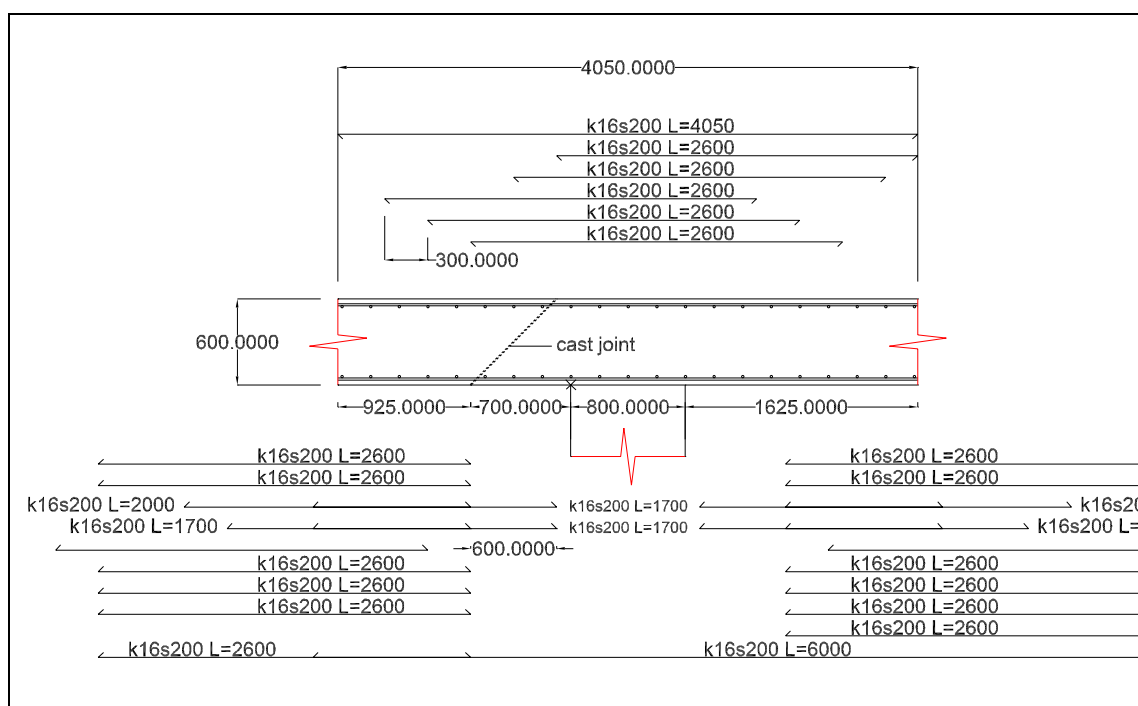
The dimensions and rebar layout of the studied slab (inspired by a quay structure from Gothenburg harbour); all dimensions are in mm.
